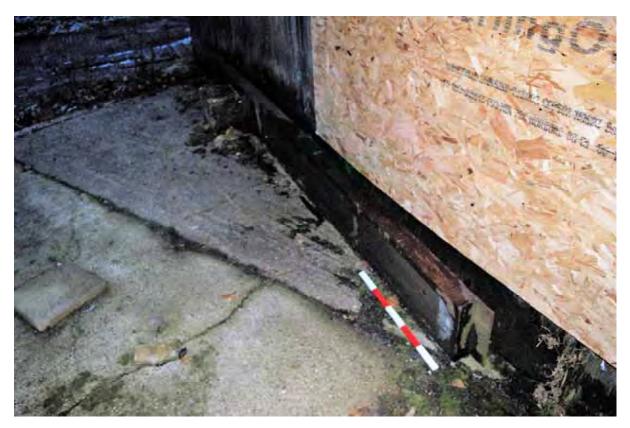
Detail of the displaced conveyor track element, situated adjacent to the southeast elevation of Building 2, facing south (551)
